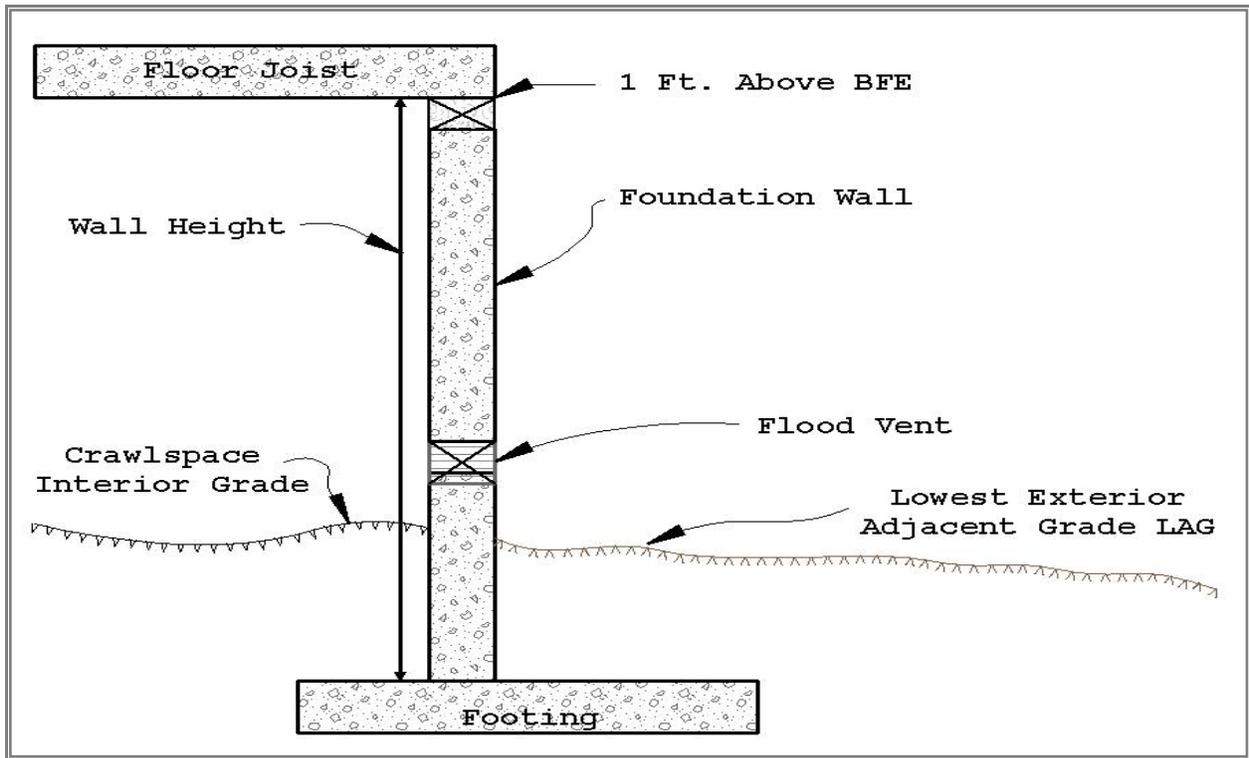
BELOW-GRADE CRAWLSPACE CONSTRUCTION
